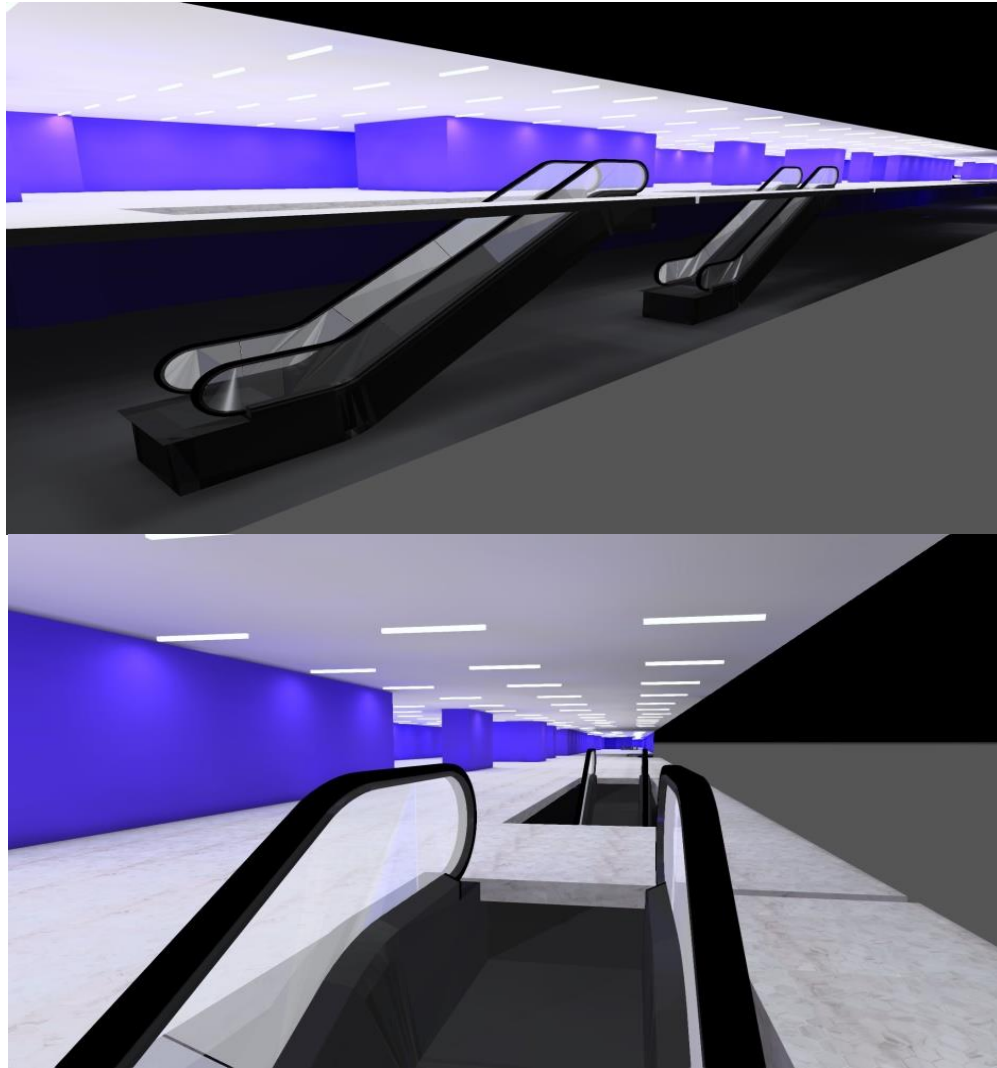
Typical Underground Metro Concourse Stair 3D Rendering
